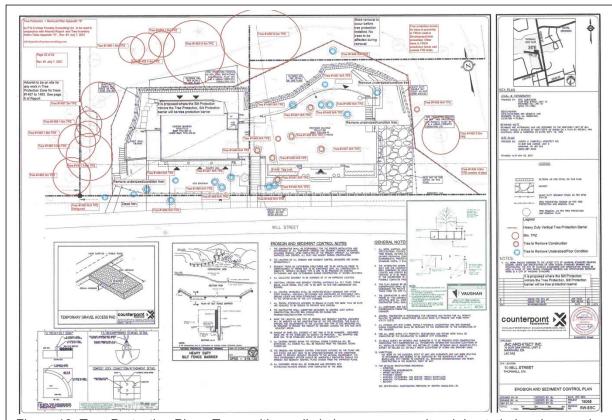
Tree Protection Plan. Trees with small circles are removed: red due to being damaged or undersized, blue due to construction. Trees with large circles are protected.
